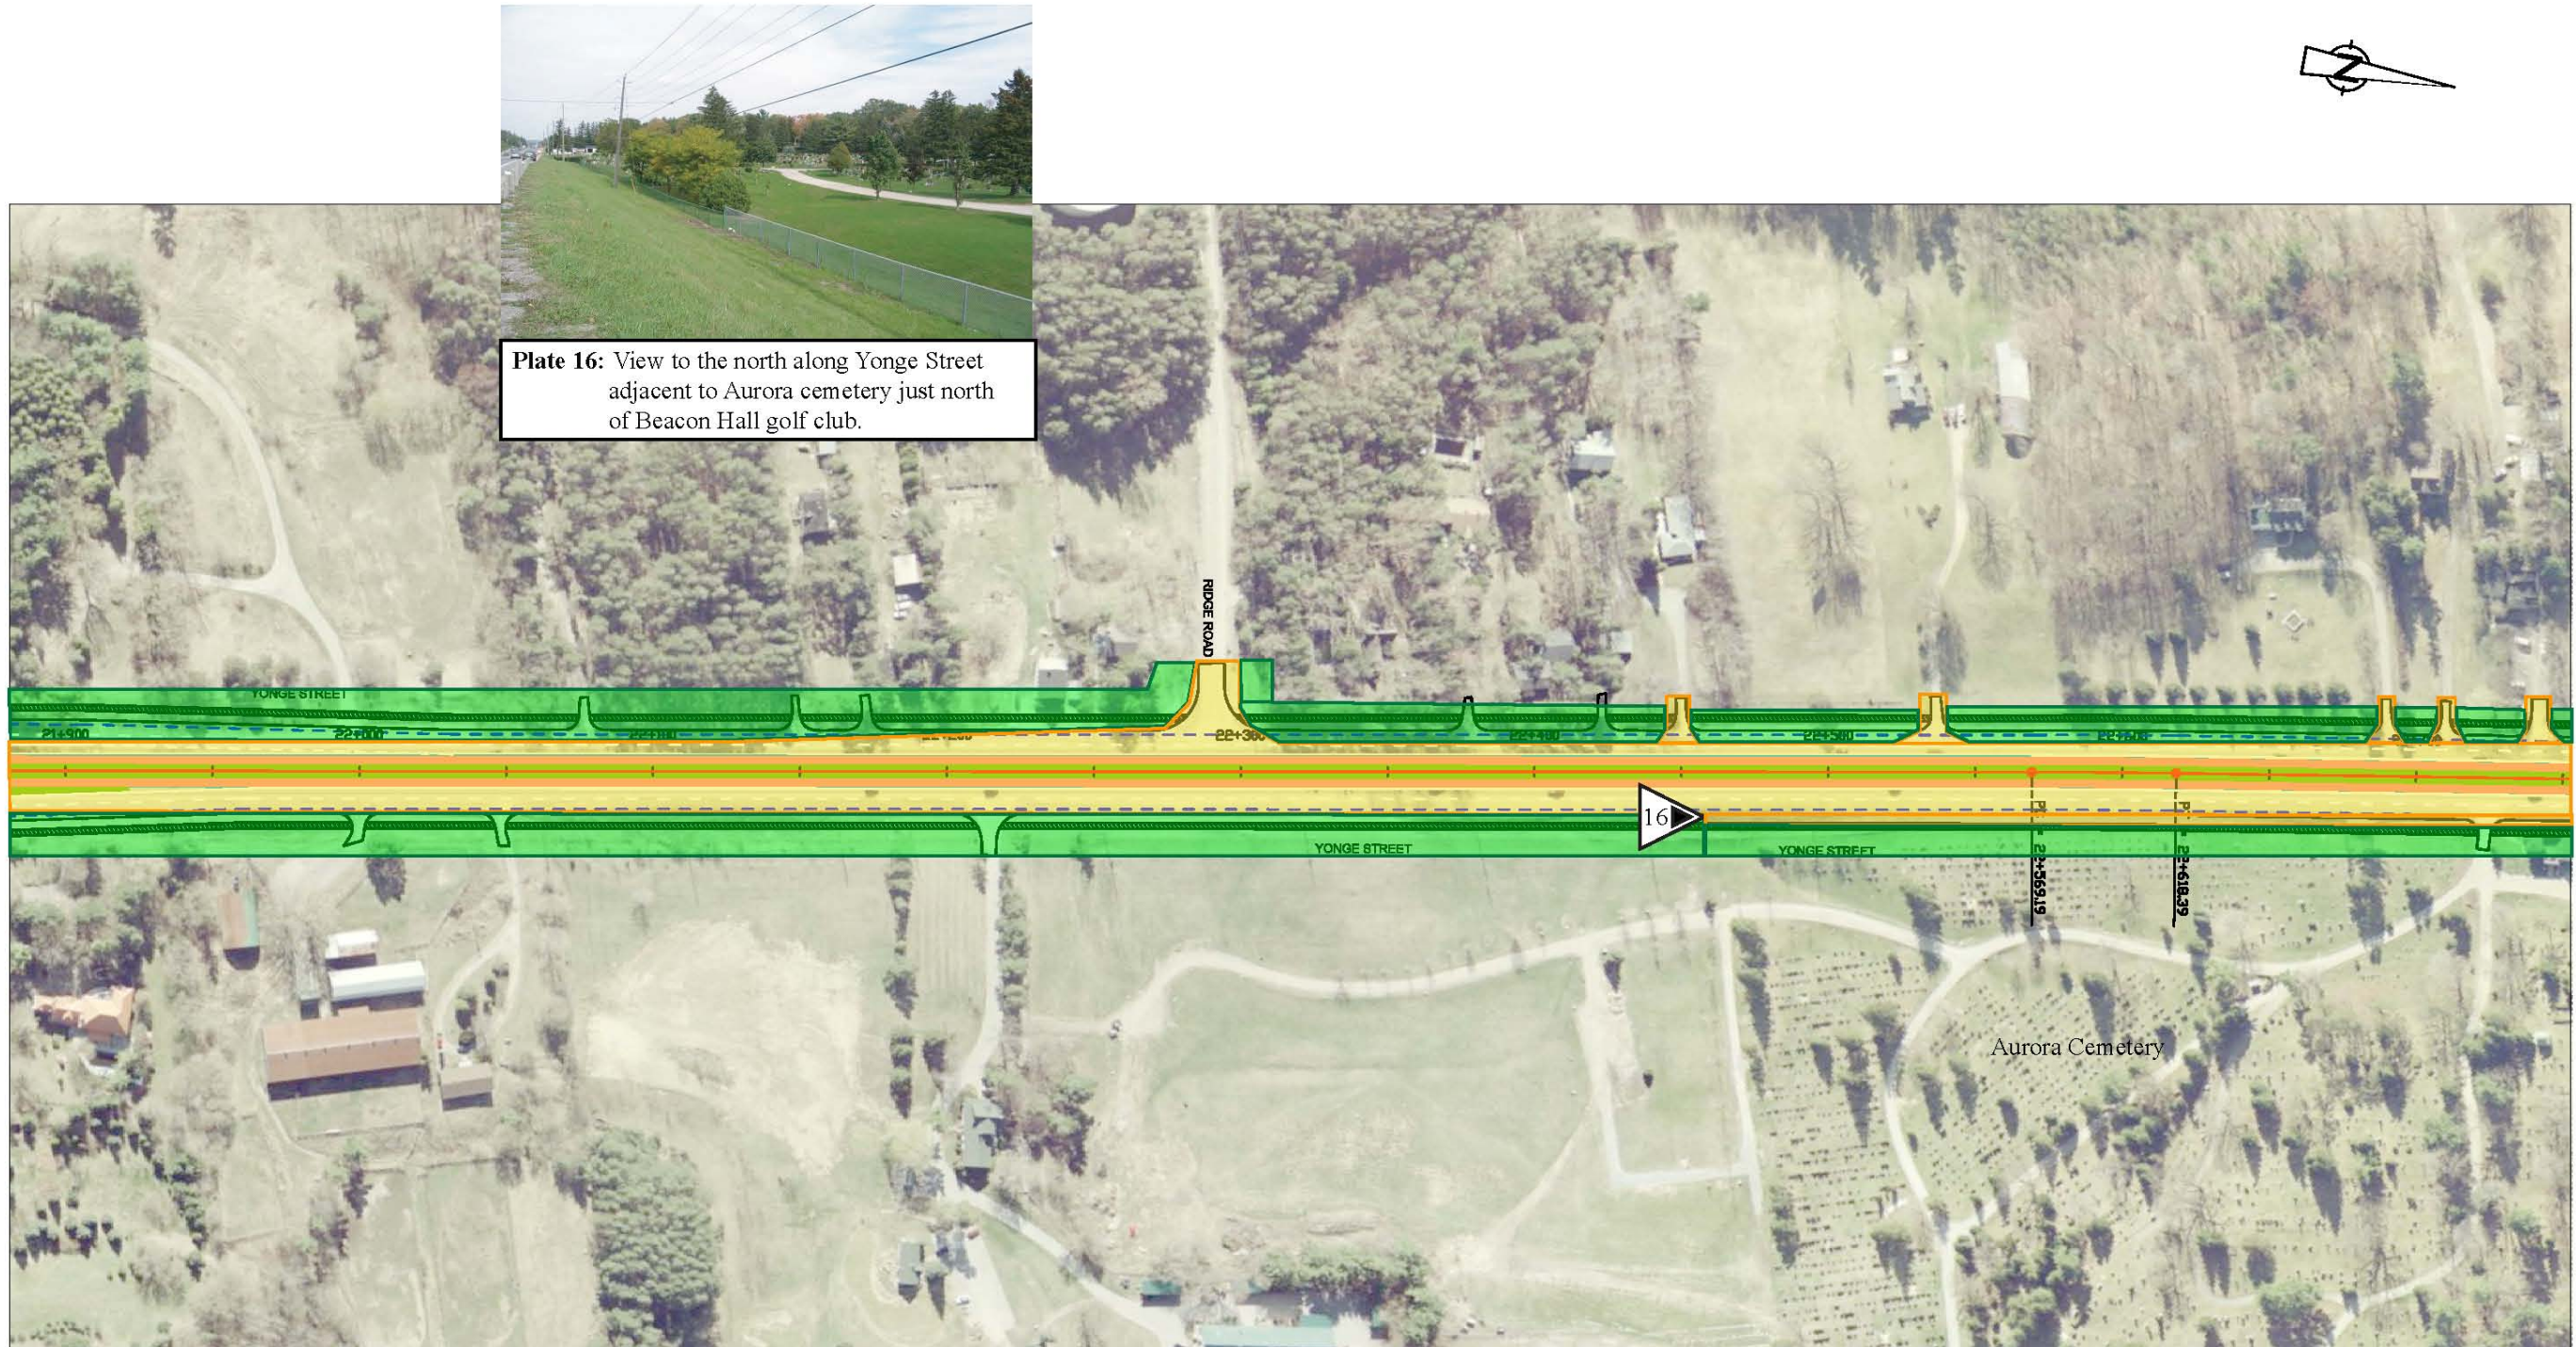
View to the north along Yonge Street adjacent to Aurora cemetery just north of Beacon Hall golf club.
